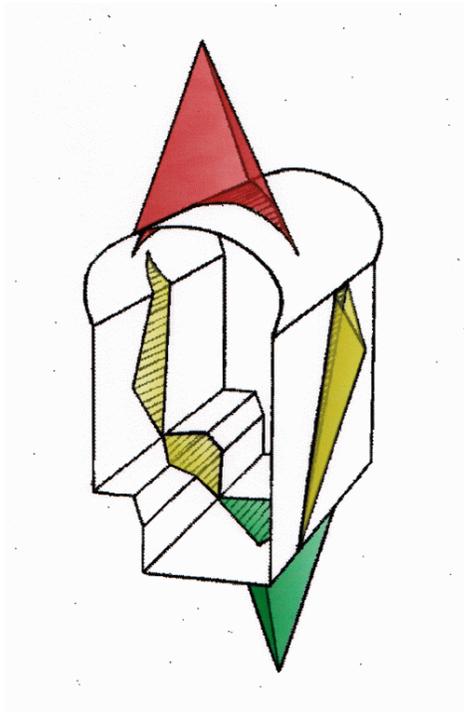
Perspective view of R o Grande power cavern showing potentially unstable wedges in the roof, sidewalls, bench and floor.
